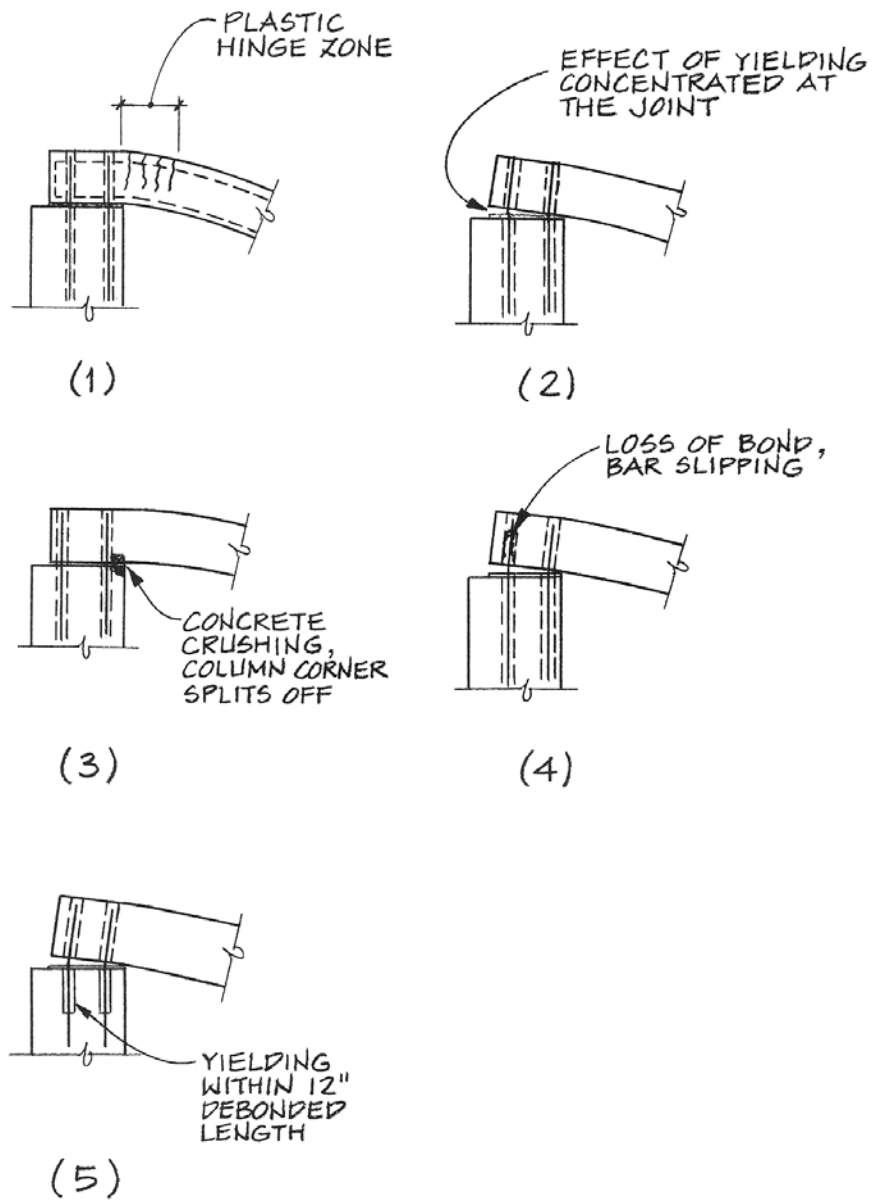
Flexural Failure Mechanisms for Precast Connection Using Grouted Ducts [1.10]
